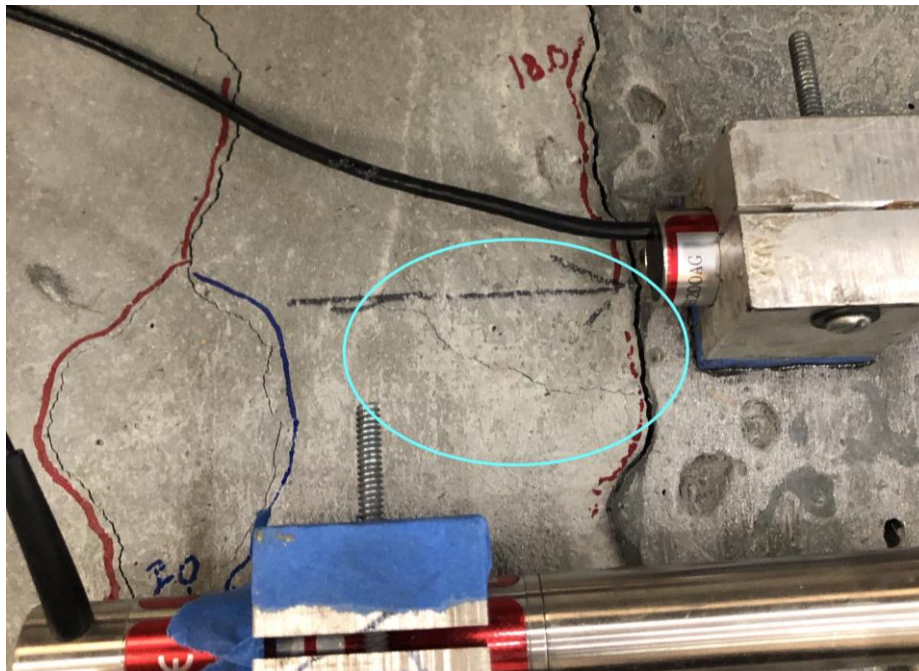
Schematic. Crack widths surrounding UHPC joint on north face of specimen.
